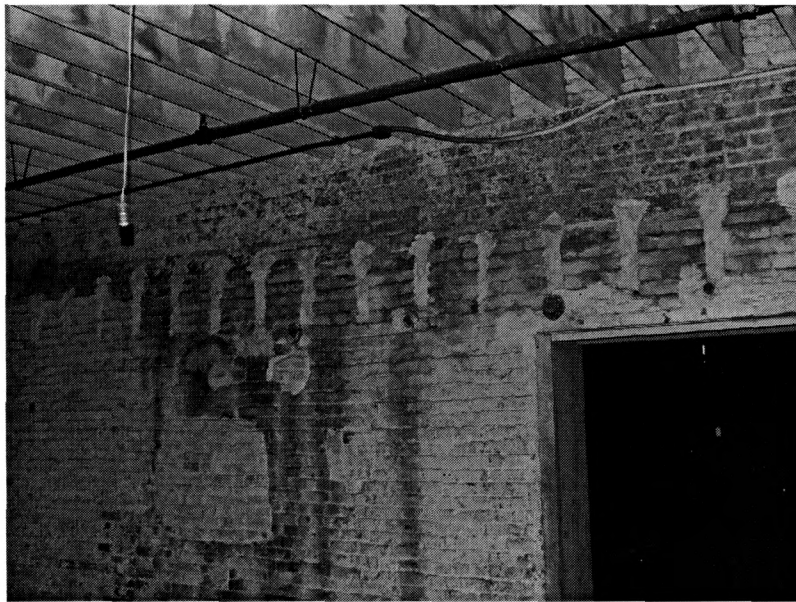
Post-1891 fire adjustment of floor level in the oil press house, second floor, view southeast (photo by J. Jacobsen, May 2007)
